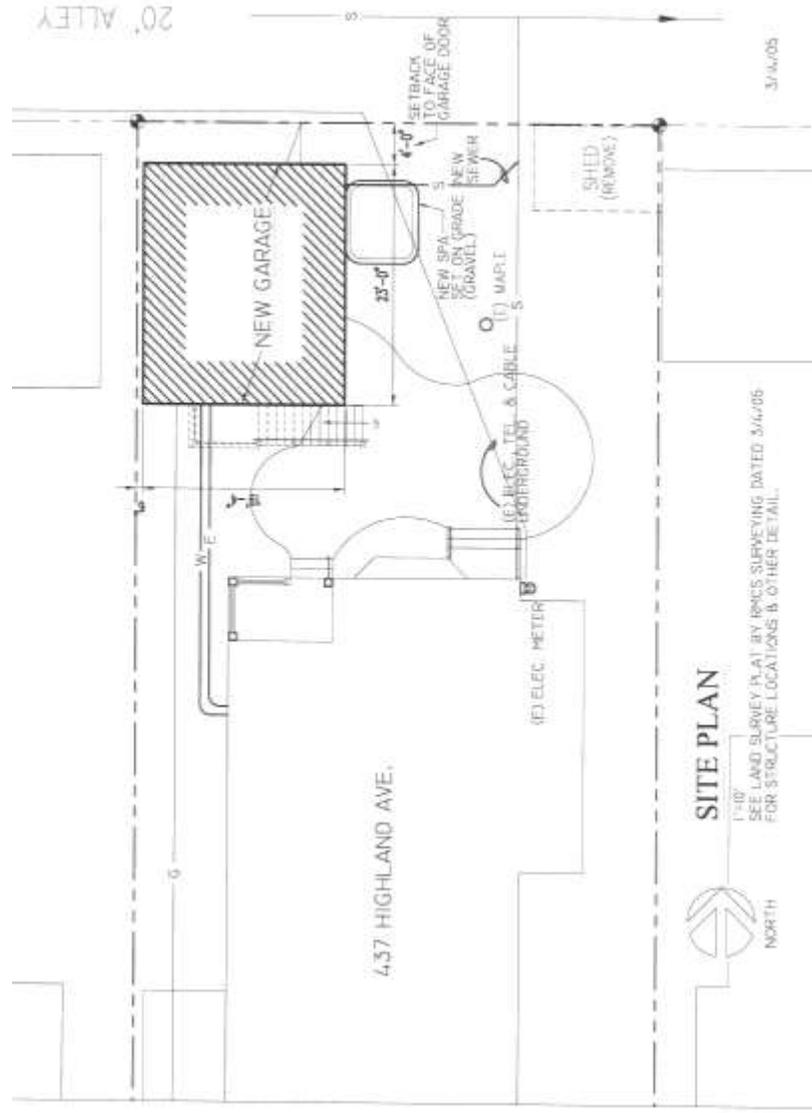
437 Highland Ave., Landscape Plan for Landmark Board Review, 2005.
